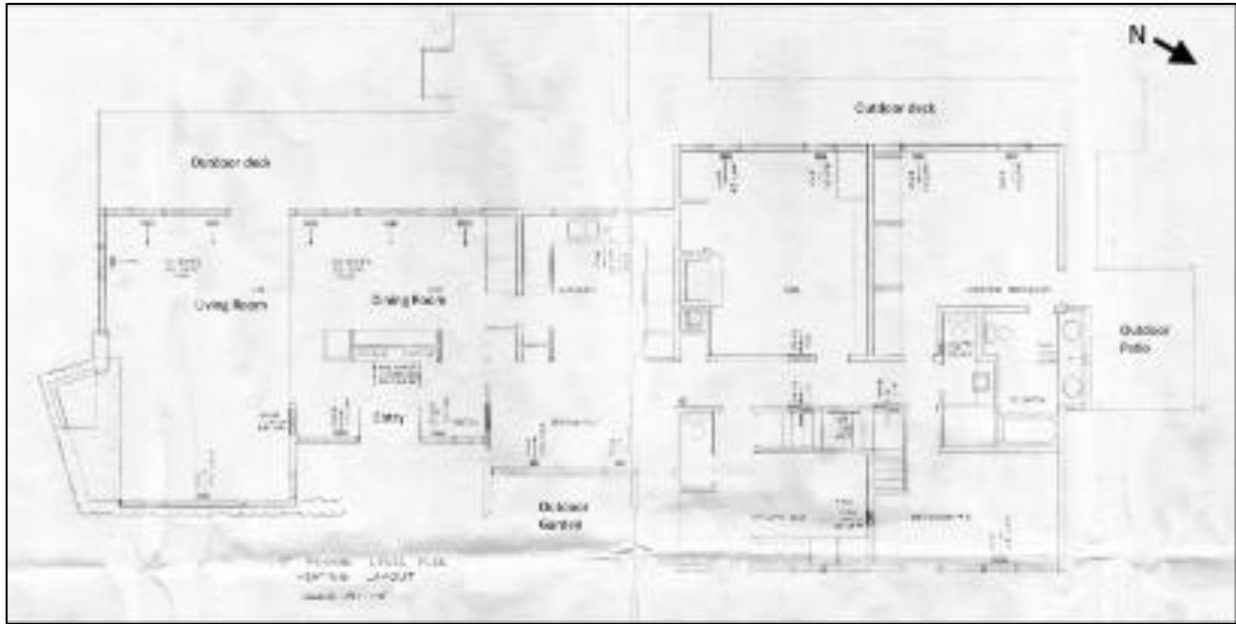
Sketch floor plan of Wenberg House. Base plan is taken from Mithun & Associates Architects' first floor heating plan, drafted by C. Myrick, June 15<sup>th</sup>, 1962. Source: Louise Bruse Wenberg Luce private collection.
